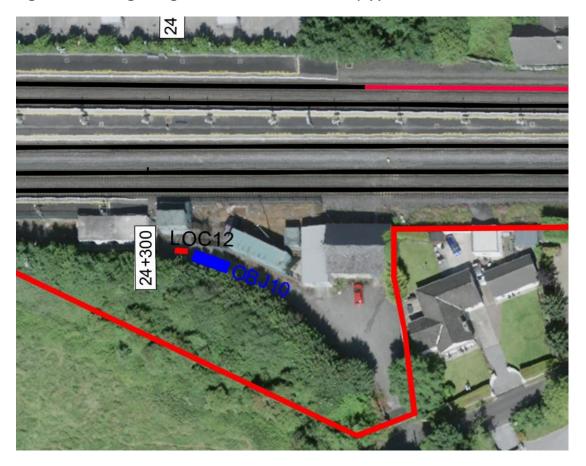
New Signalling / LV Infrastructure location (Adjacent to Hazelhatch Station)
